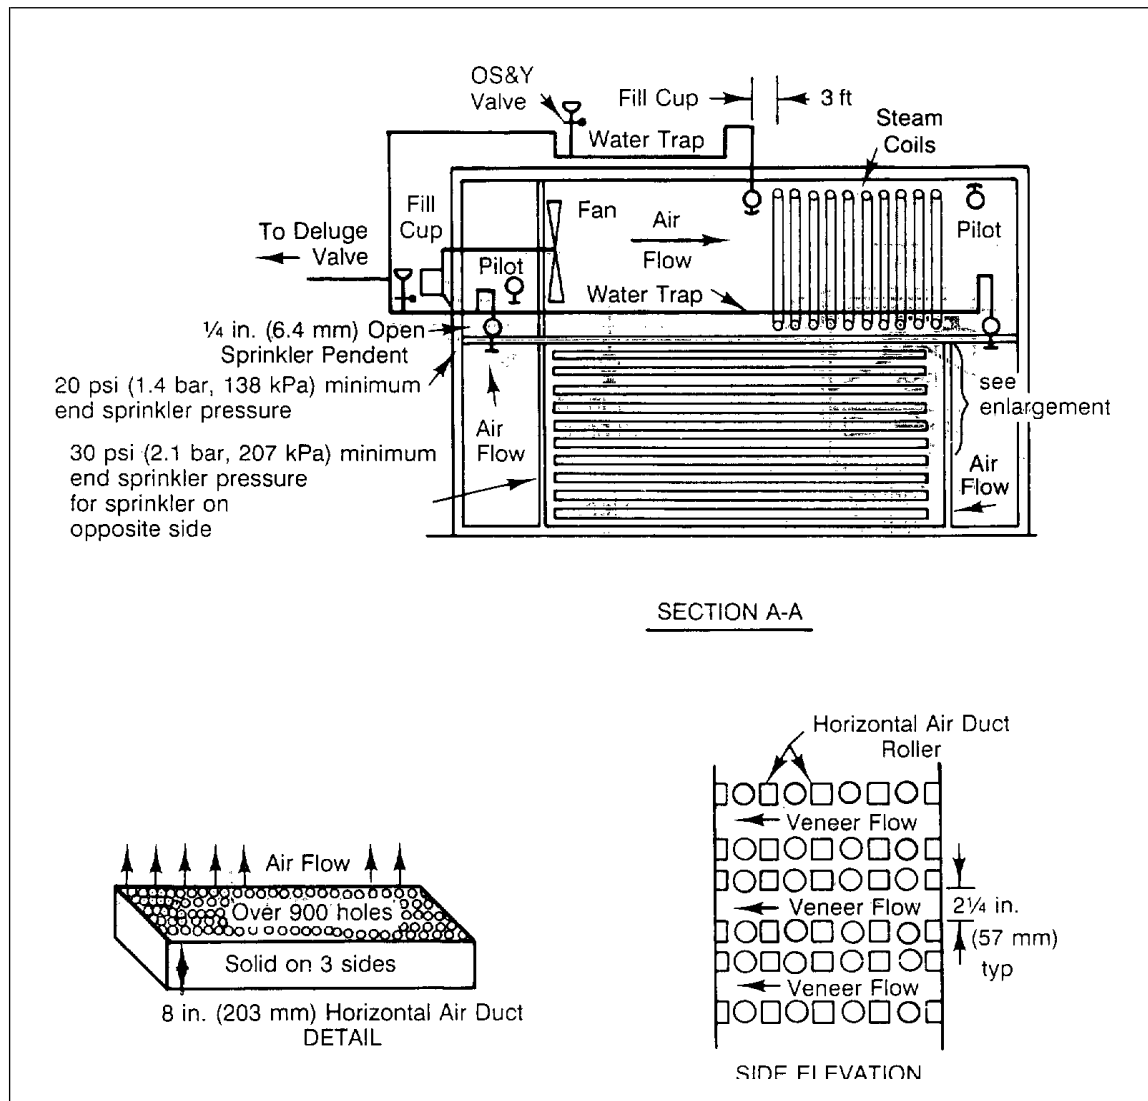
Typical arrangement of deluge protection for special vertical jet-type dryer.
